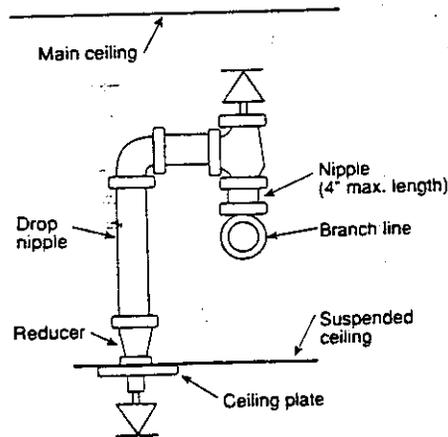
(b) Sprinklers in concealed space and below ceiling.
